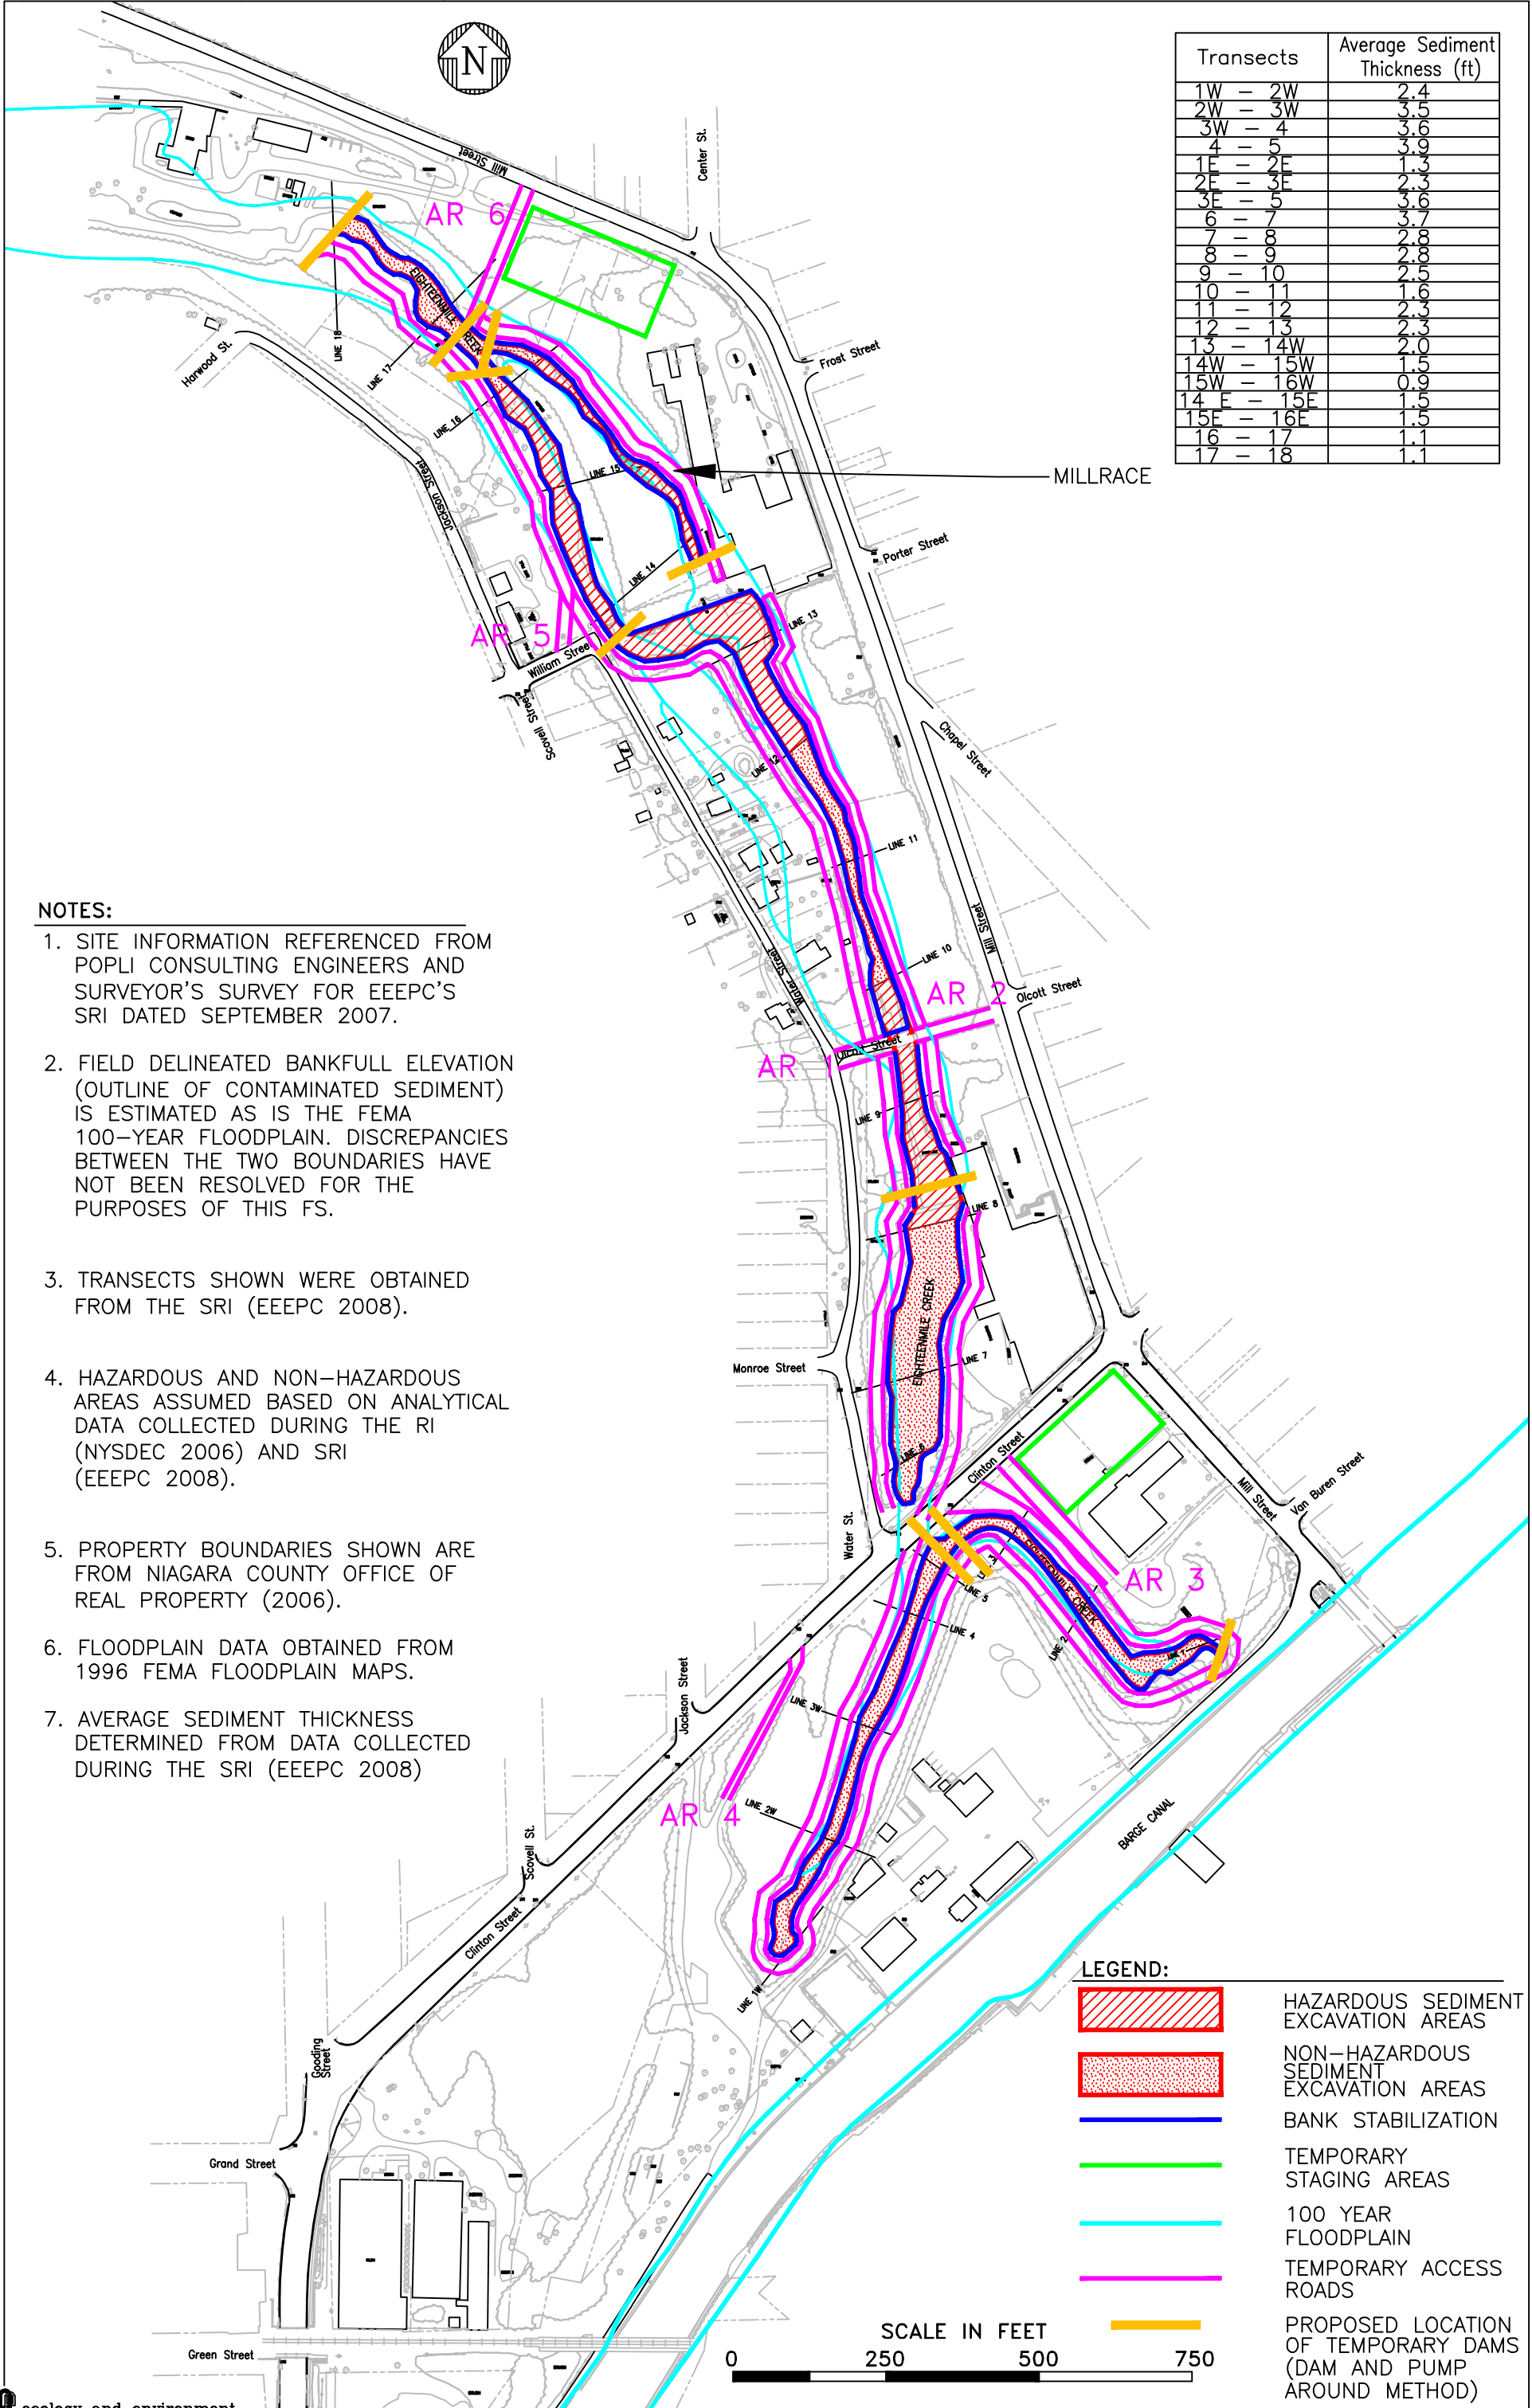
ALTERNATIVE 2 - COMPLETE EXCAVATION AND OFF-SITE DISPOSAL, BANK STABILIZATION
